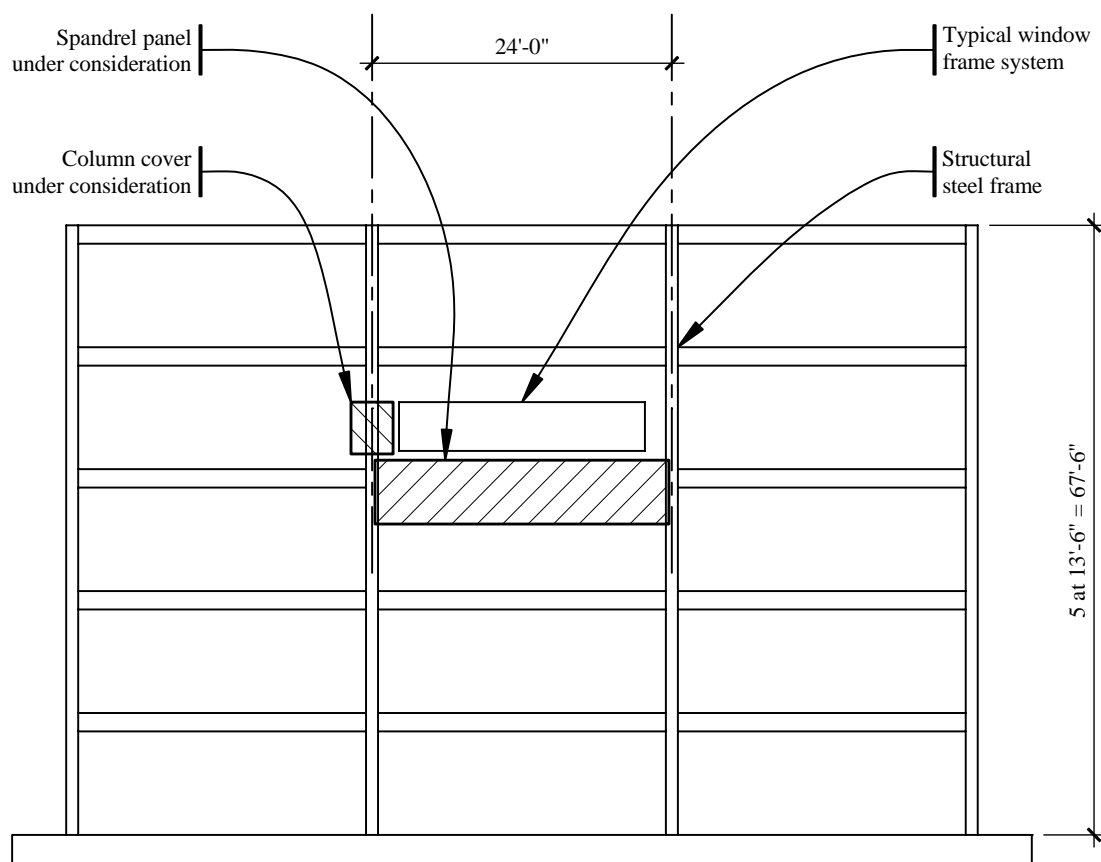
Five-story building elevation showing panel location (1.0 ft = 0.3048 m)
